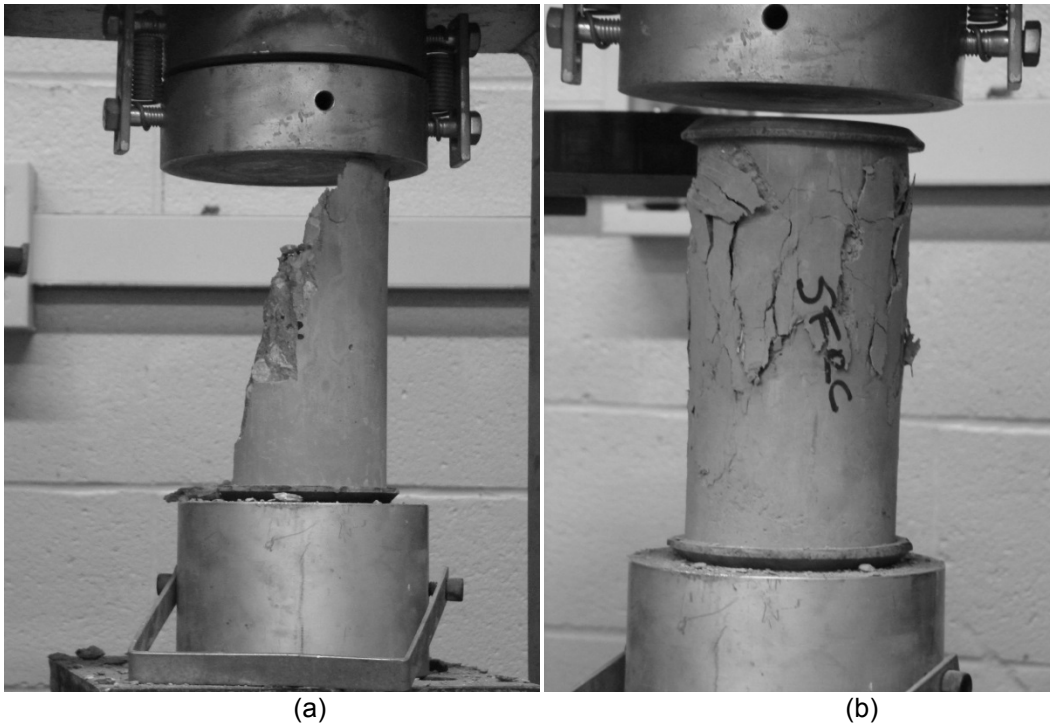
Typical plain concrete cylinders after testing (a) and steel fiber reinforced concrete cylinder after testing (b)
